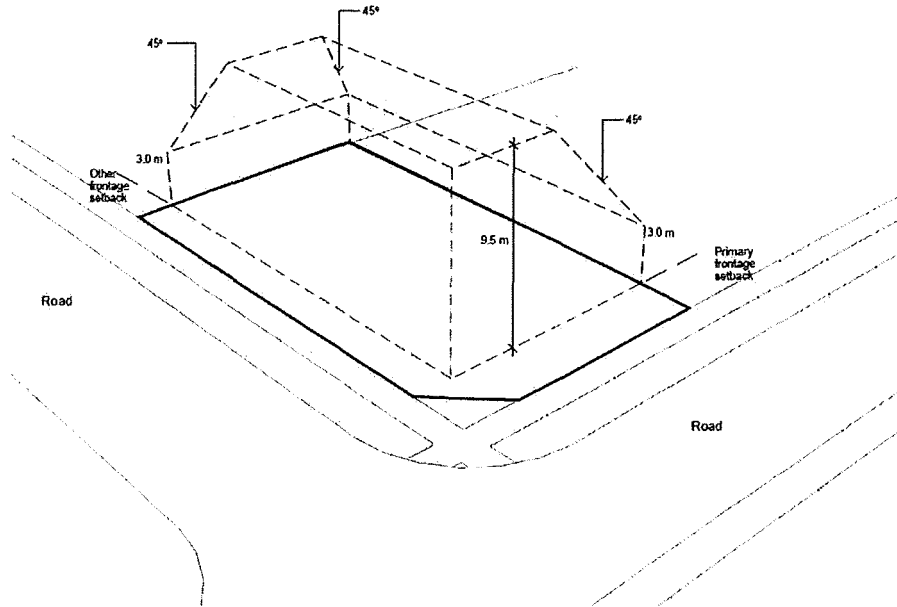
Building envelope for corner lots as required by clause 9.4.2 A3(a) and clause 9.5.1 A2(a)
